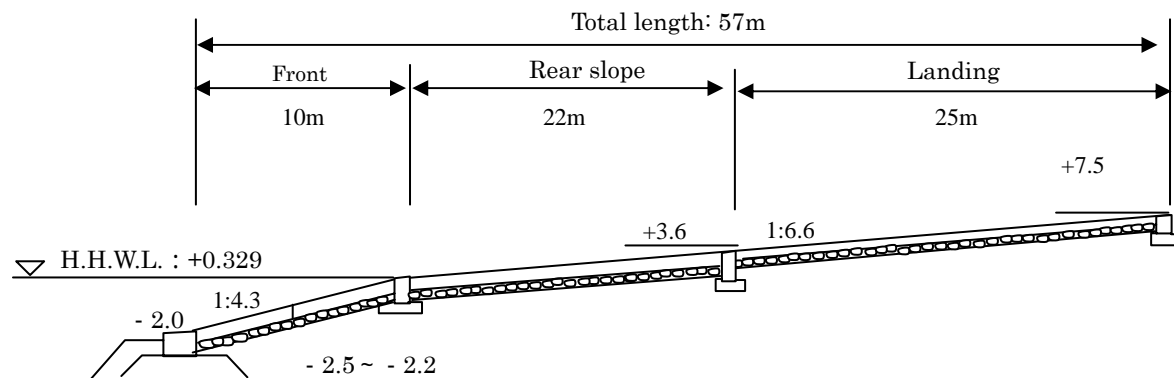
(5) Cross-Sectional Structure of Slipway
